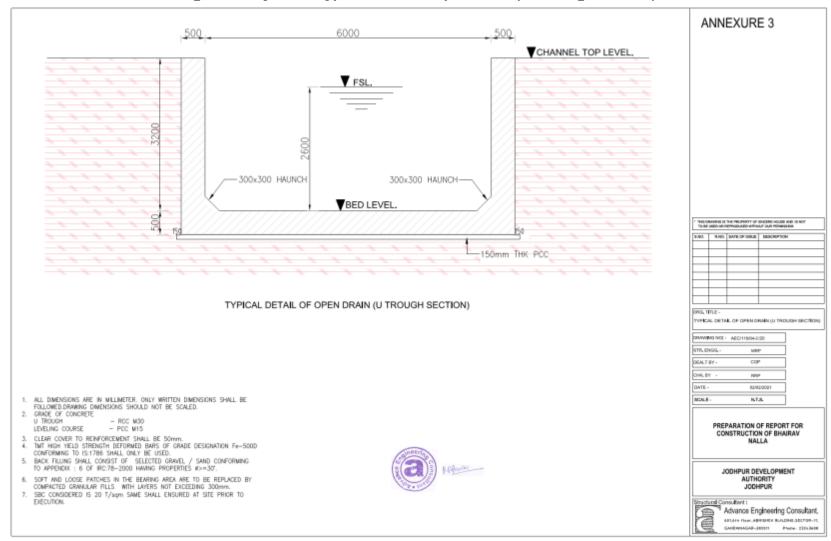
Layout of Typical Detail of Open Drain (U Through Section)
